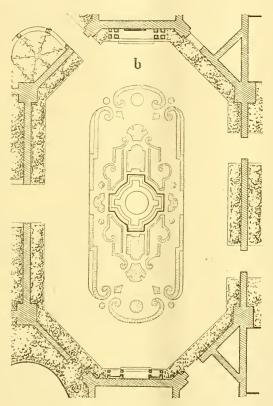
A hall laid out with beds, surrounded with balconies, derlin bxhidition.
